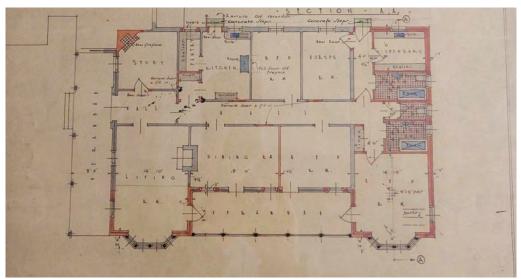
Plan for 'Alterations & Additions to Head Masters House, Barker College', prepared by Joseland & Gilling, architects, and signed by contractor J. Harper on 25 October 1928. (Source: Barker College Archives, Plan M0005).
